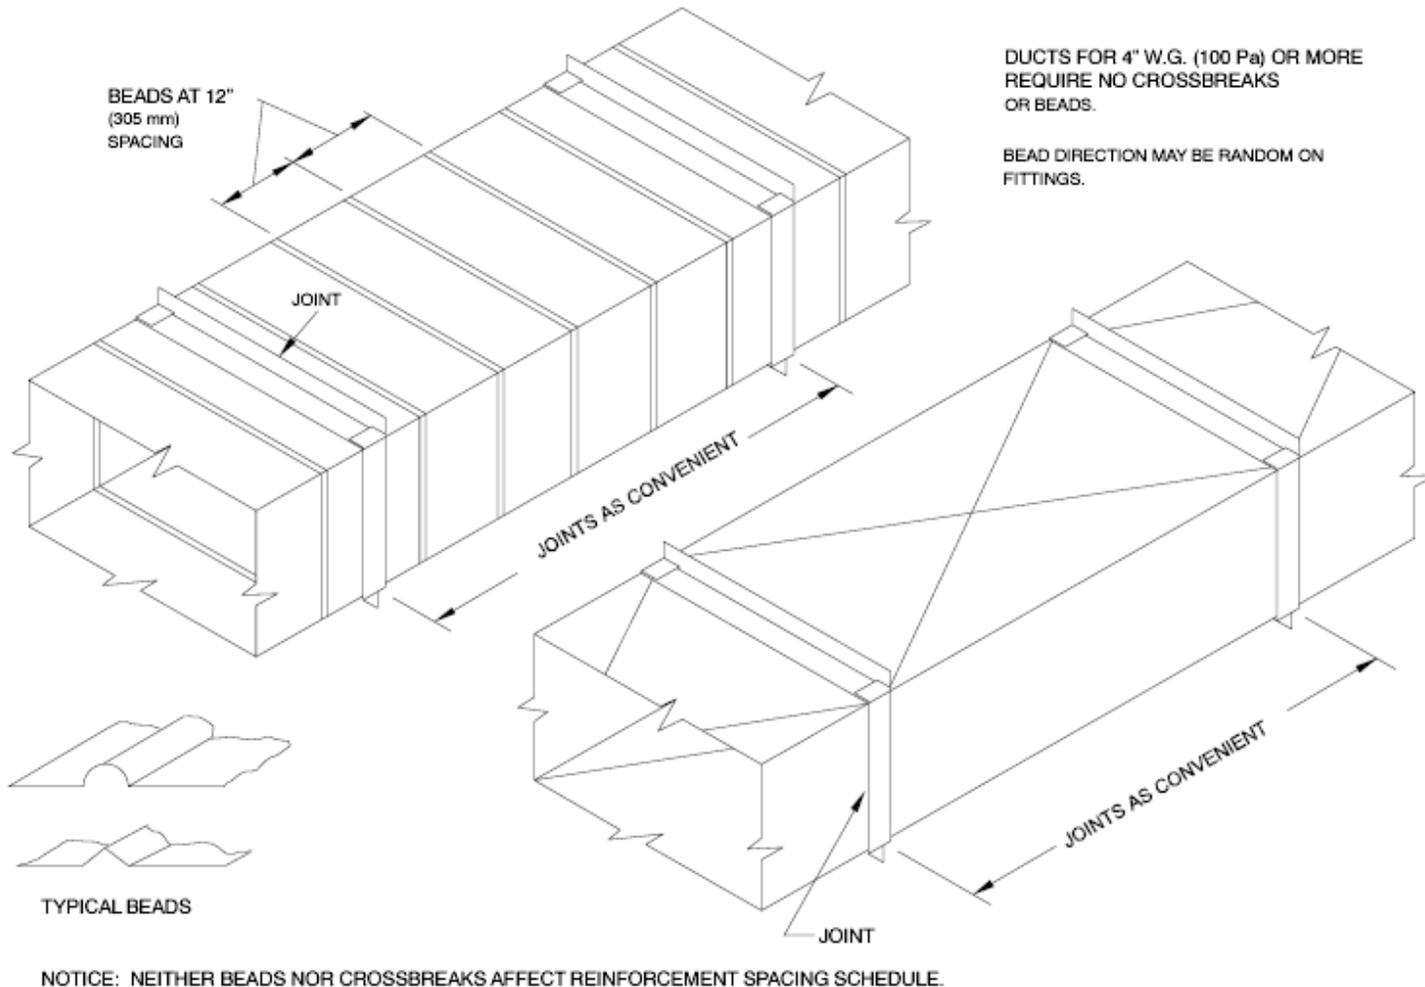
CROSSBROKEN AND BEADED DUCT
